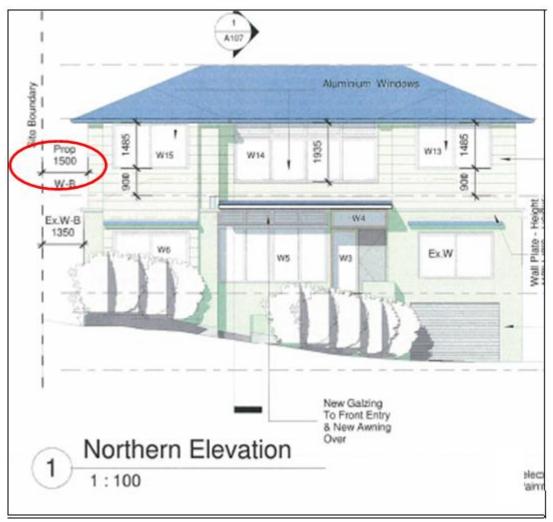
Northern Elevation showing the first floor side setback of 1500mm.
